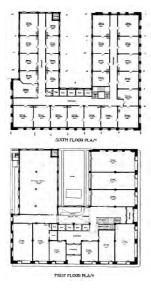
Plans of Wainwright Building, 1890 (Morrison, 1952, p. 149)
